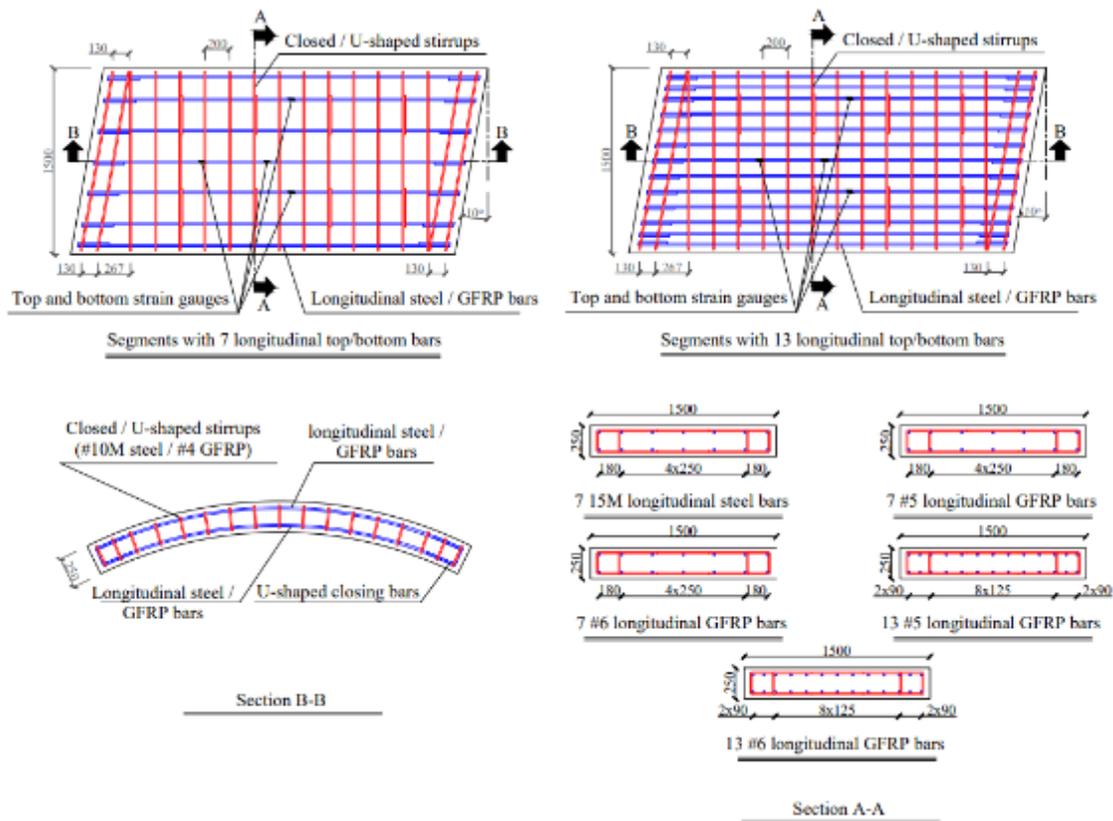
Reinforcement details for the test specimens. (Note: all dimensions in mm)
